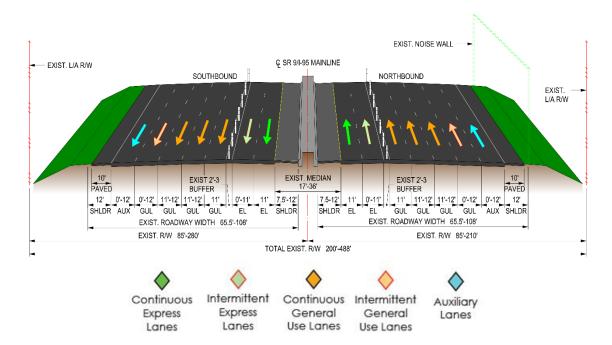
1: Existing Typical Section - I-95/SR 9 Mainline and Express Lanes
